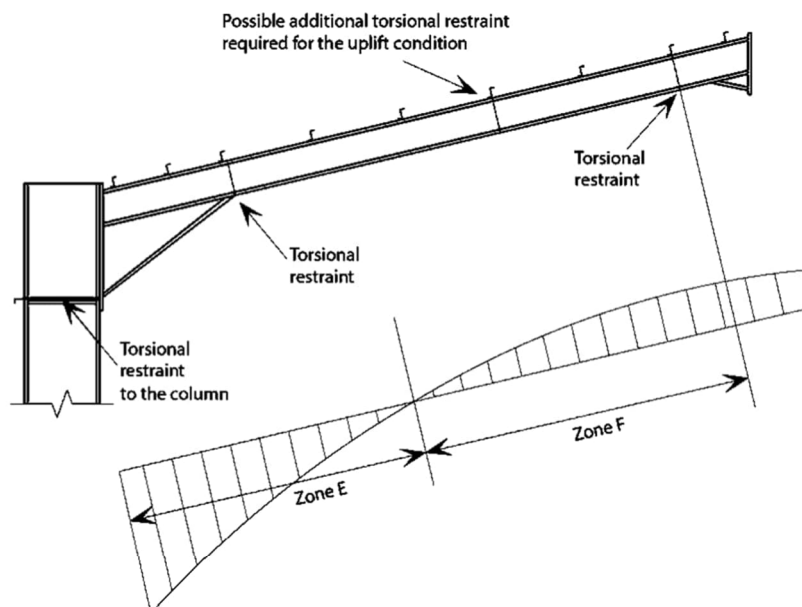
Typical restraints arrangements on a portal frame: uplift [4]
